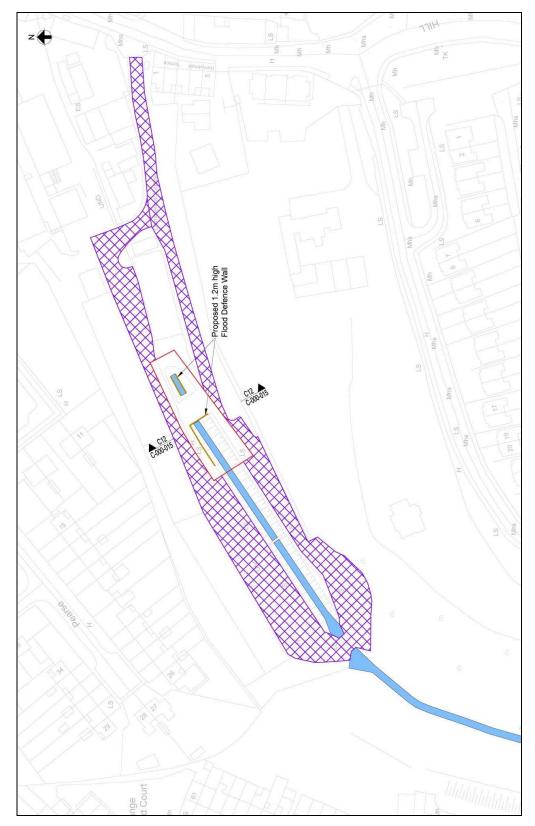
Proposed works to Grange Stream, Donnybrook Commercial Park (after Arup)
